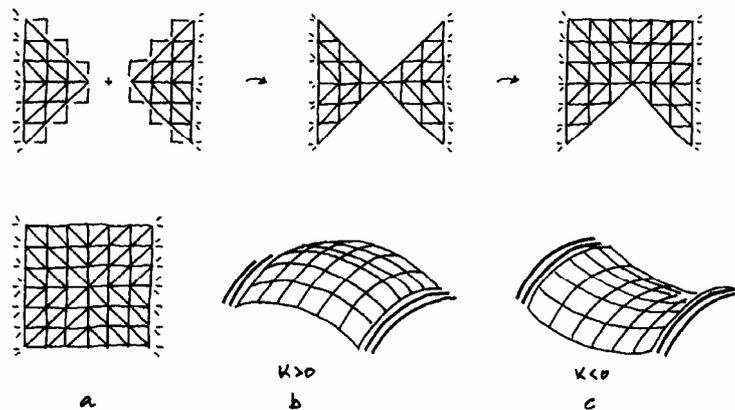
a) The construction of the translation truss system from 4 successively built systems. b) Facetted translation shell with positive Gaussian curvature. c) Shell with negative Gaussian curvature.
